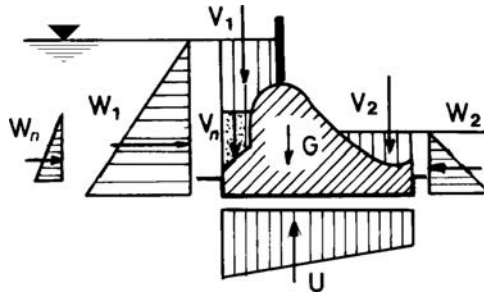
Schematic presentation of forces acting on a gravity dam on soil foundation.
